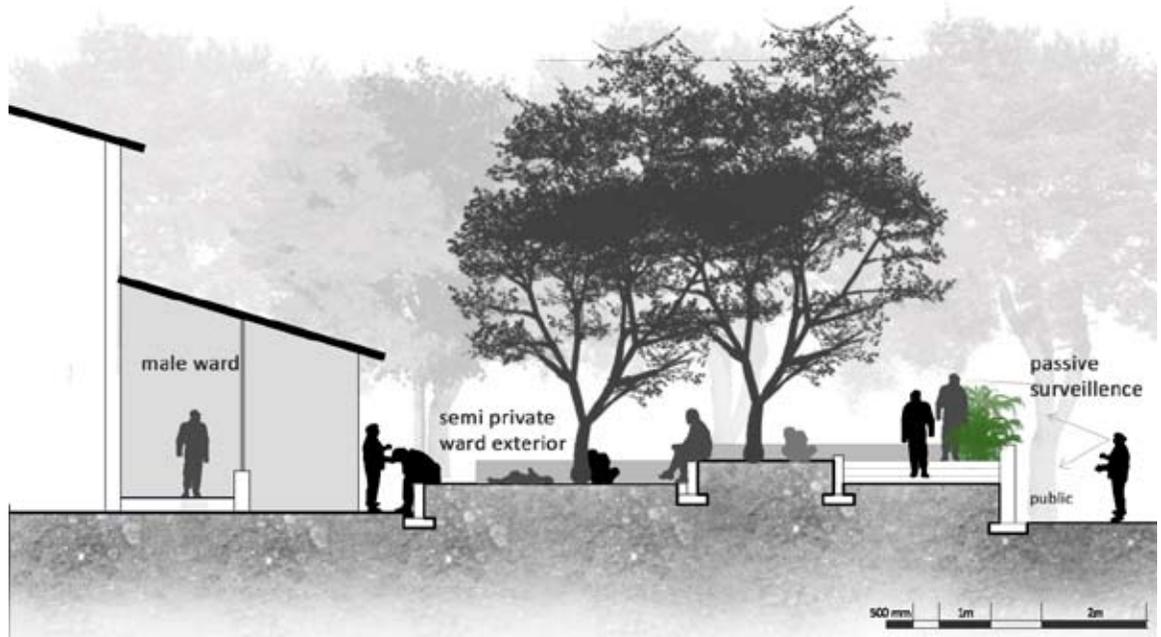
Section of the semi private outdoor room at the male ward. Retaining walls form a visual boundary (Author, 2009).
